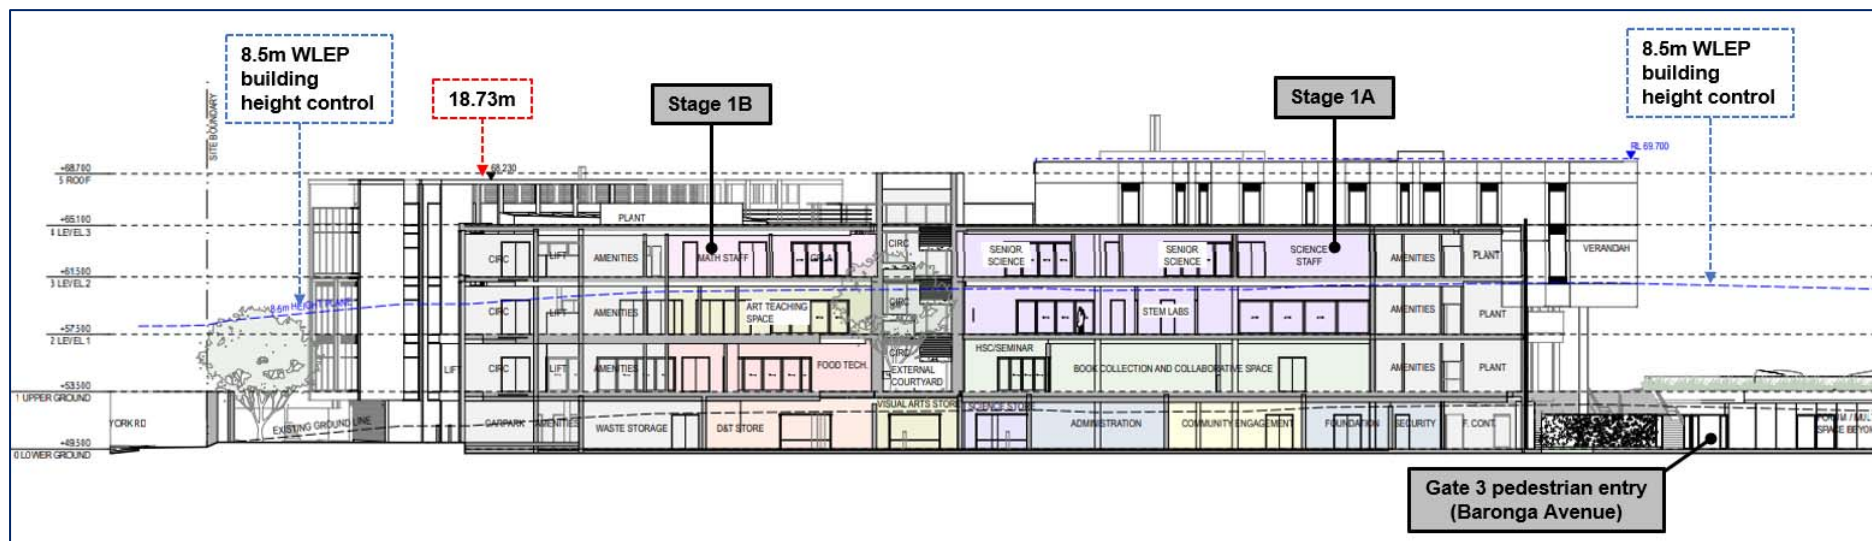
| Long section – eastern profile (Base source: Applicant's RtS)
